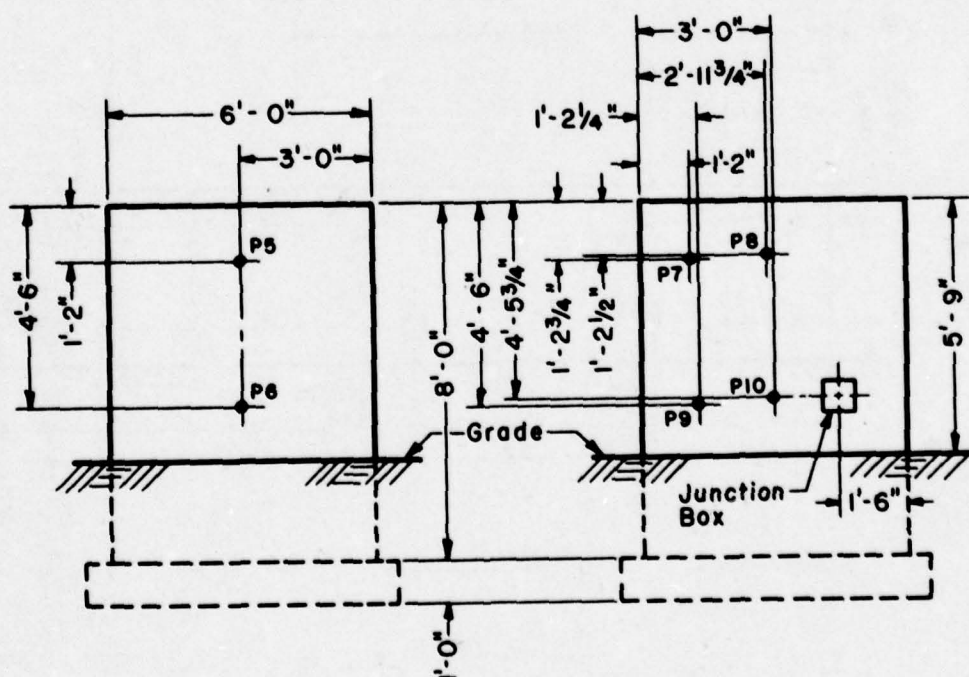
Structure 3.1b, plan view and rear elevation.
